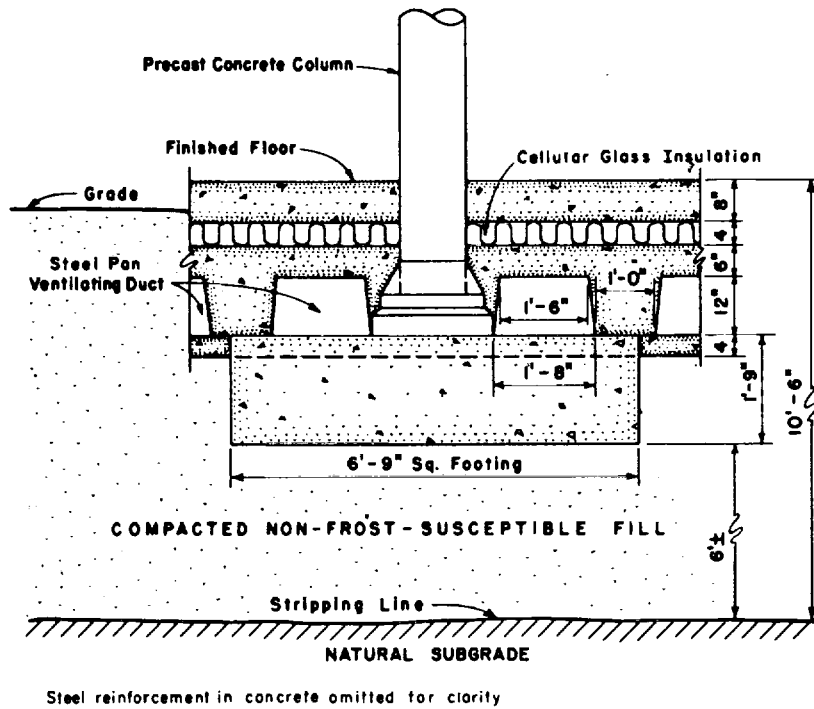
Pan duct foundation, Thule, Greenland⁸⁶. See figure 4-22 for site conditions.
